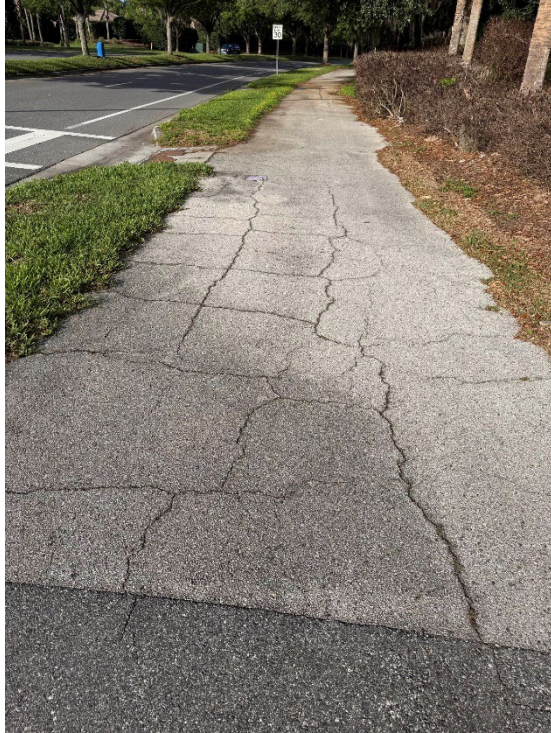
Asphalt Raveling and Base Failure
